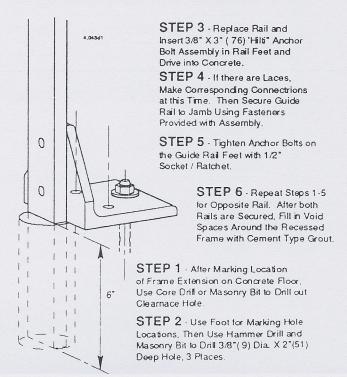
Guide Rail Floor Prep. / Anchorage
